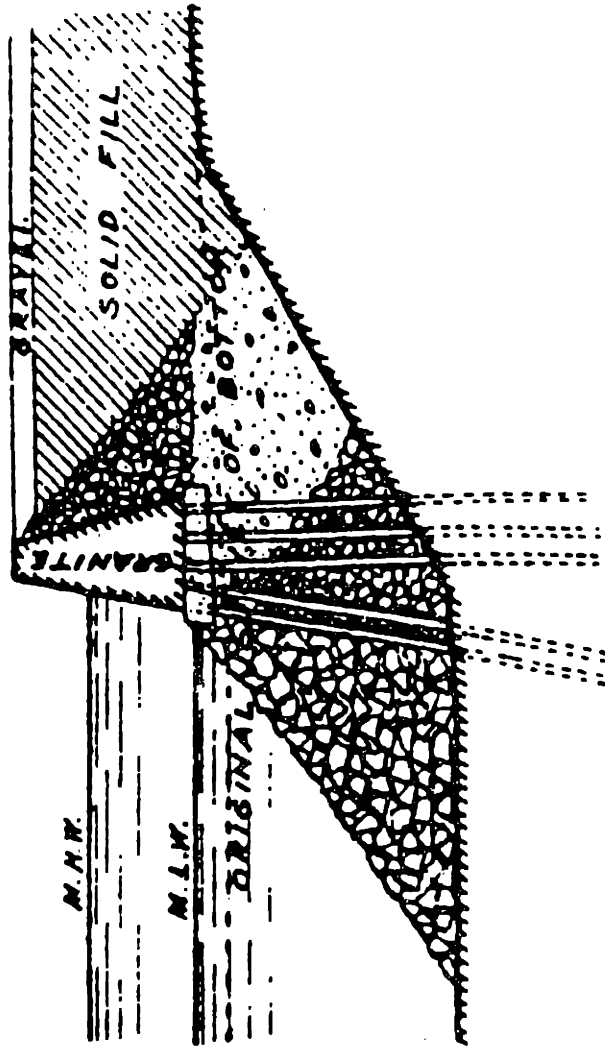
Typical Cross-section of Seawall 'F' (Harbor and Land Commissioners, 1910)
